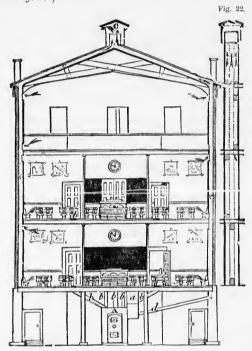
Section of a School-House, showing System of Heating and Ventilation.
